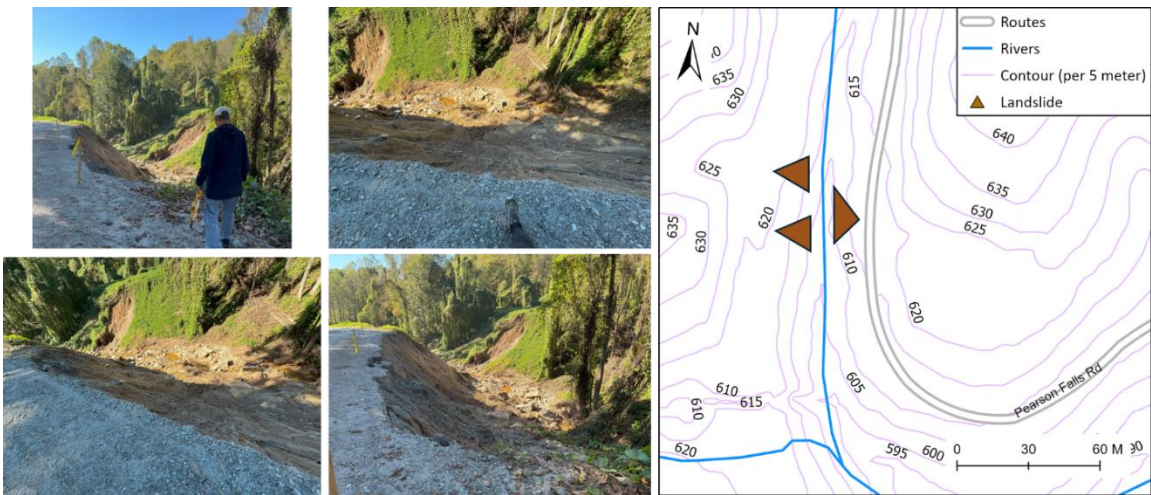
Multiple slope failures on both sides of a small stream. (Photo Credits: Sophia Lin and Shenan Chen)
